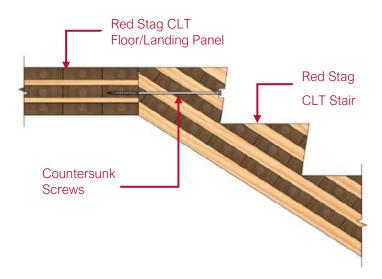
Red Stag CLT stair panel to CLT landing/floor panel connection.
